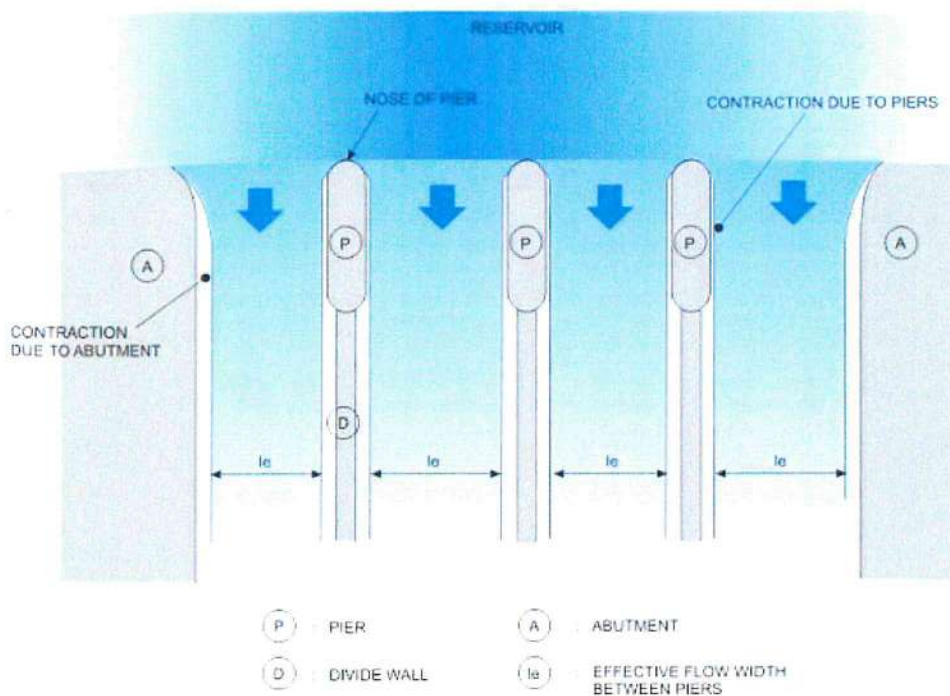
Abutment and pier contractions shown on a spillway plan
